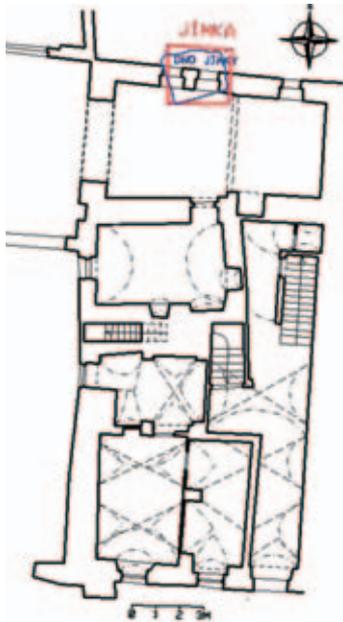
Tábor – house no. 308. Ground-floor layout of a building, including a sketch of the sump, filled with material around 1600. The front half of the structure of the tank protrudes into the building, the rear half extends through the outside wall of the building. Archaeological excavation by the Hussite Museum in Tábor in 2001.
